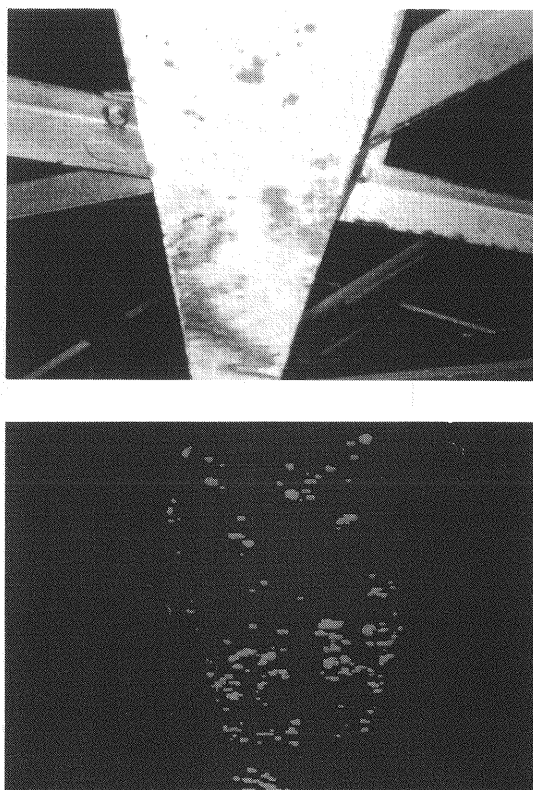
Top: Original Image of Bridge Girder Paint Film Deterioration
